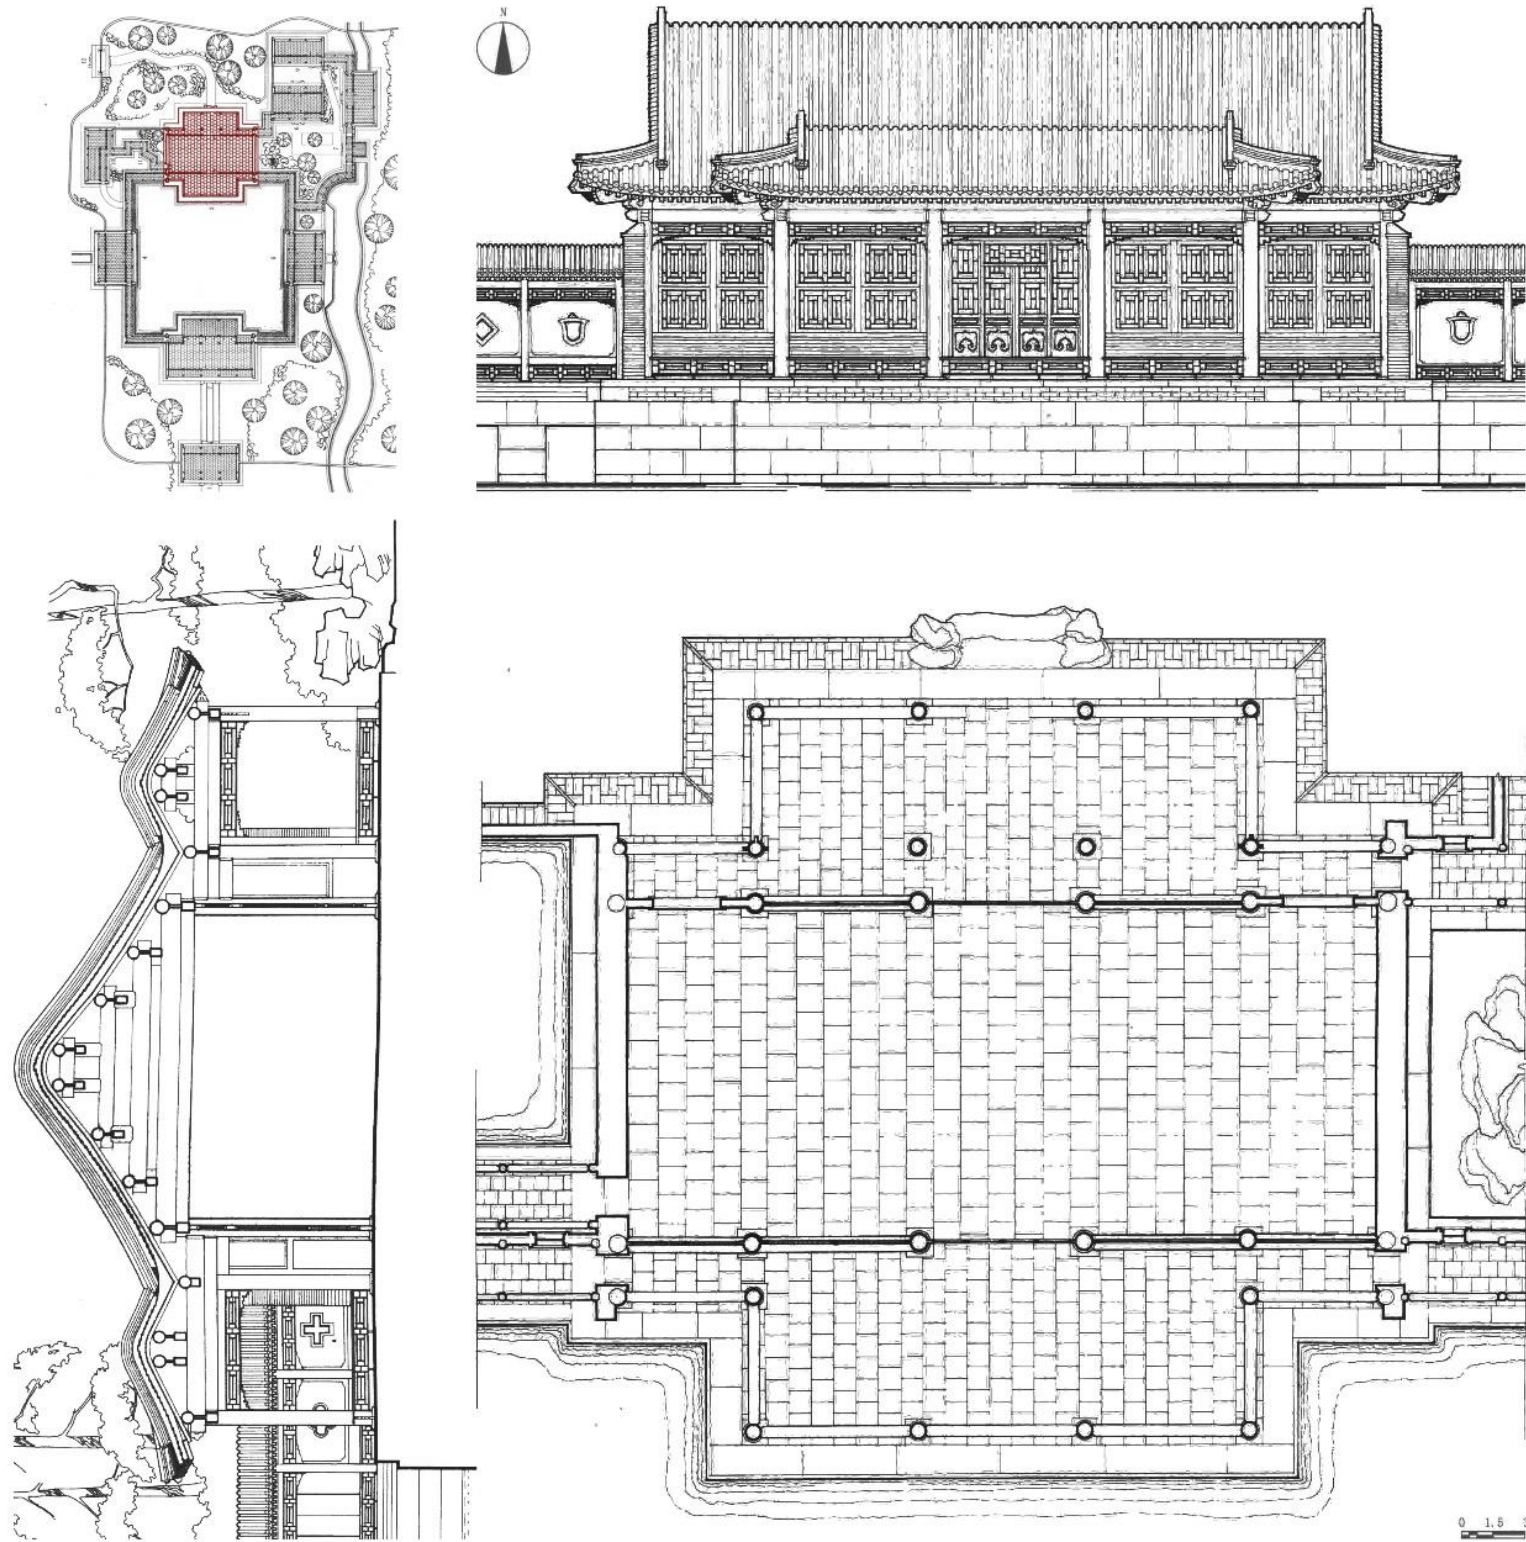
The elevation, plan, and section drawings of Huafang Zhai.
